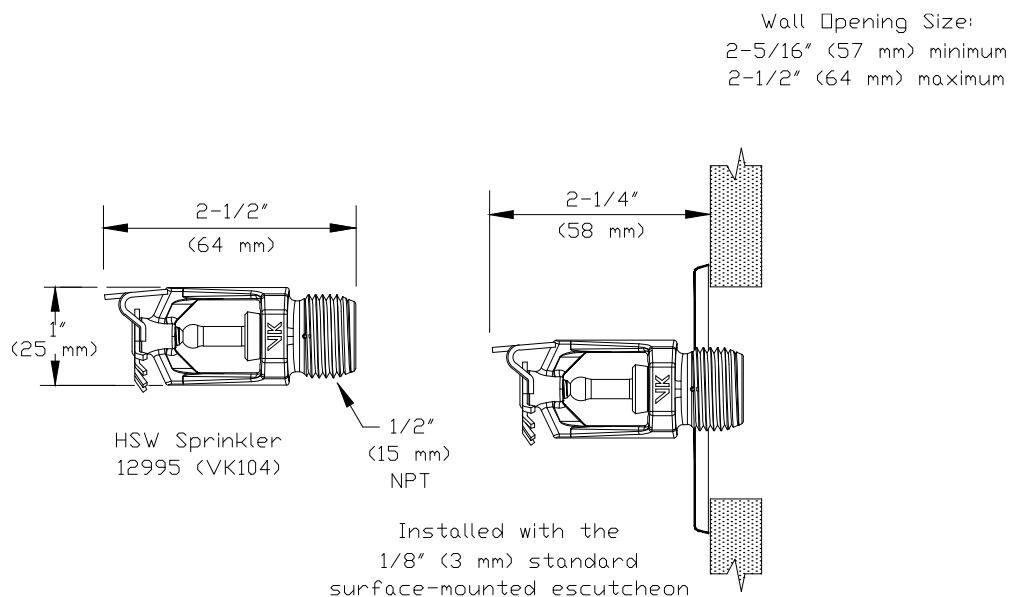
Horizontal Sidewall Sprinkler Dimensions with a Standard Escutcheon
